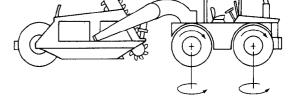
THREE AXLES, FRONT-WHEEL STEER, CENTER-AXLE DRIVE
